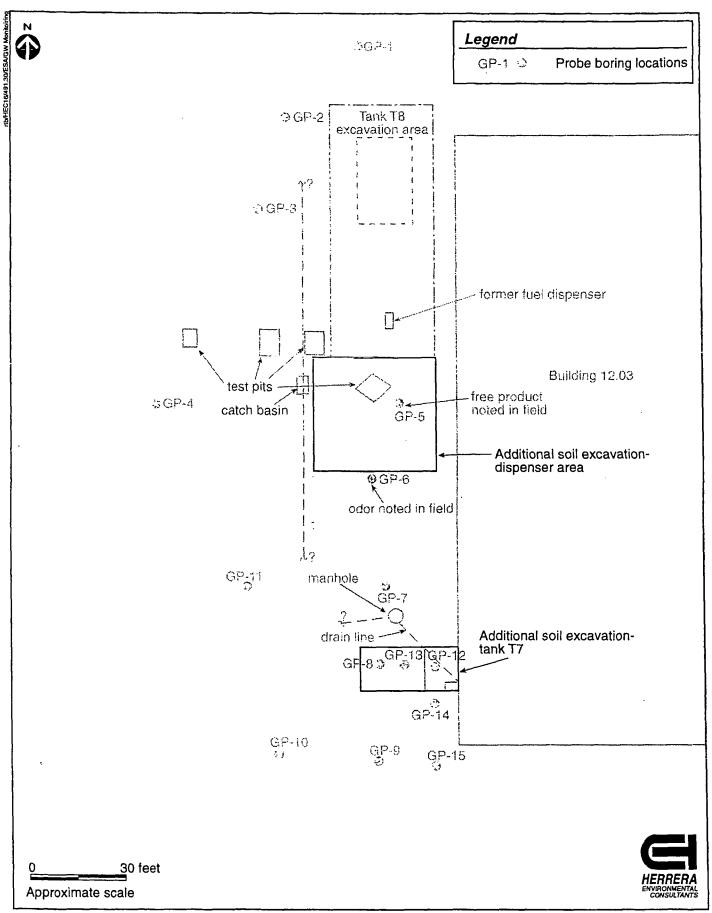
Areas of additional soil excavation near tanks T7 and T8 at Federal Center South, Seattle, Washington.
